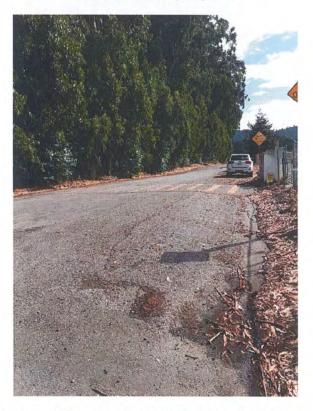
RP 1. Intersection of Mattole Rd (State Road No.: FC3010) and Chambers Rd (County maintained. State Road No.: 2D020). Photo taken facing east.
